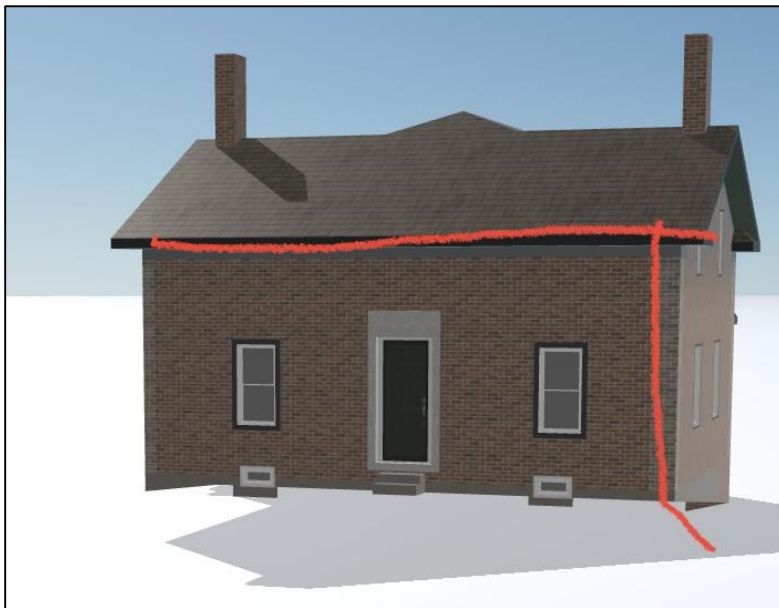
Drawing of the northern elevation identifying the proposed locations where the eavestroughs and downspouts will be installed (highlighted in red).
